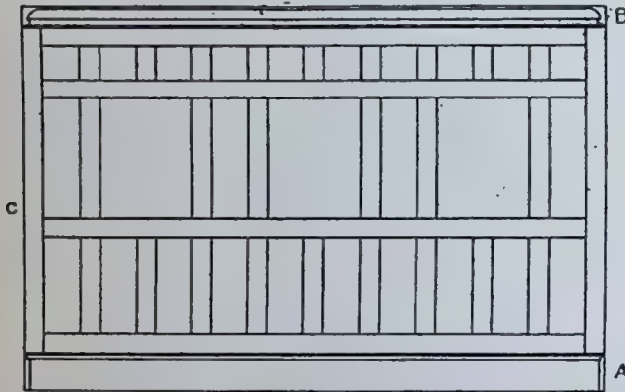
PANELLING FOR DOOR SIDE OF ROOM.
